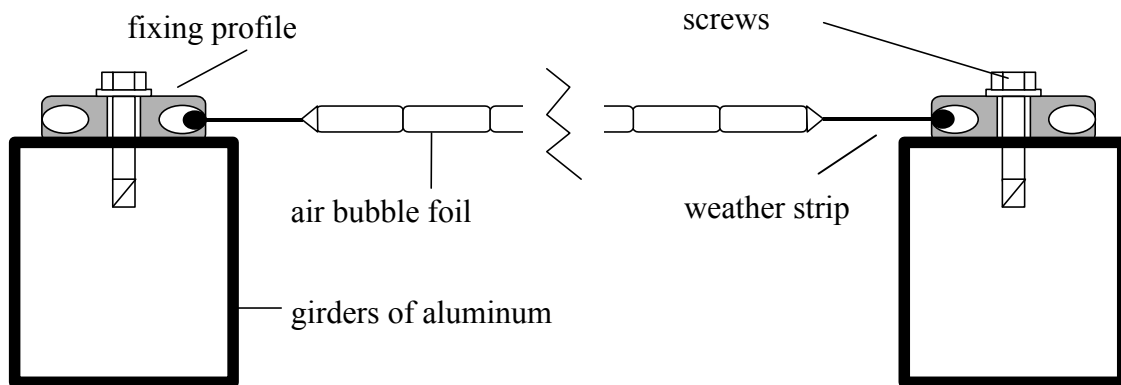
Cross section of the fastening system for air bubble foils [51]
